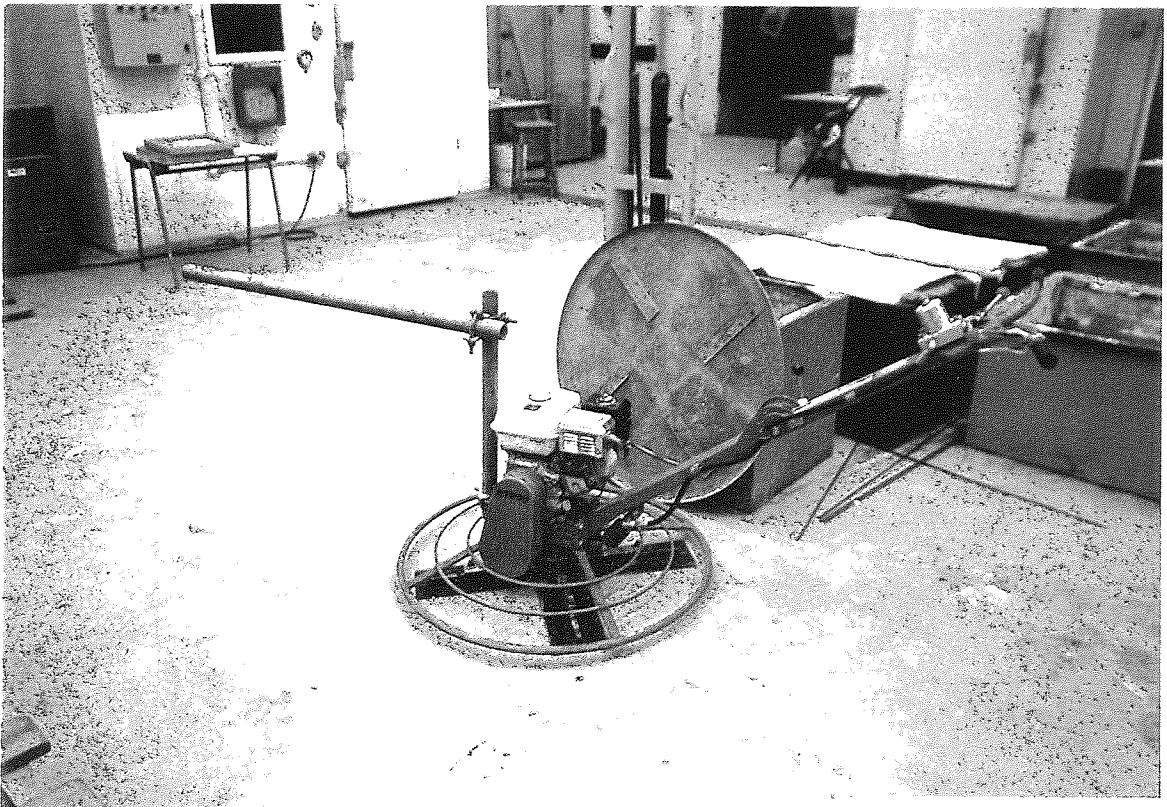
The apparatus used for power finishing, showing the additional stabilising bar.
